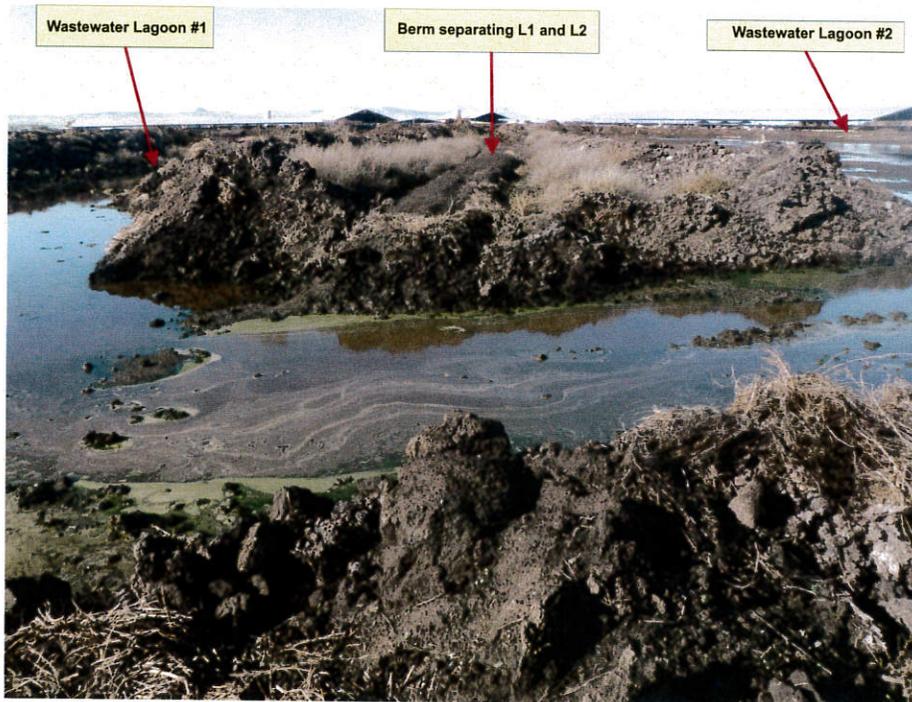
Looking west at Wastewater Lagoon #1 and Wastewater Lagoon #2. Significant amounts of solid manure and wastewater remain in both lagoons. Staff wanted to inspect the berm separating the lagoons for damage but it wasn't accessible at the time of the inspection.
